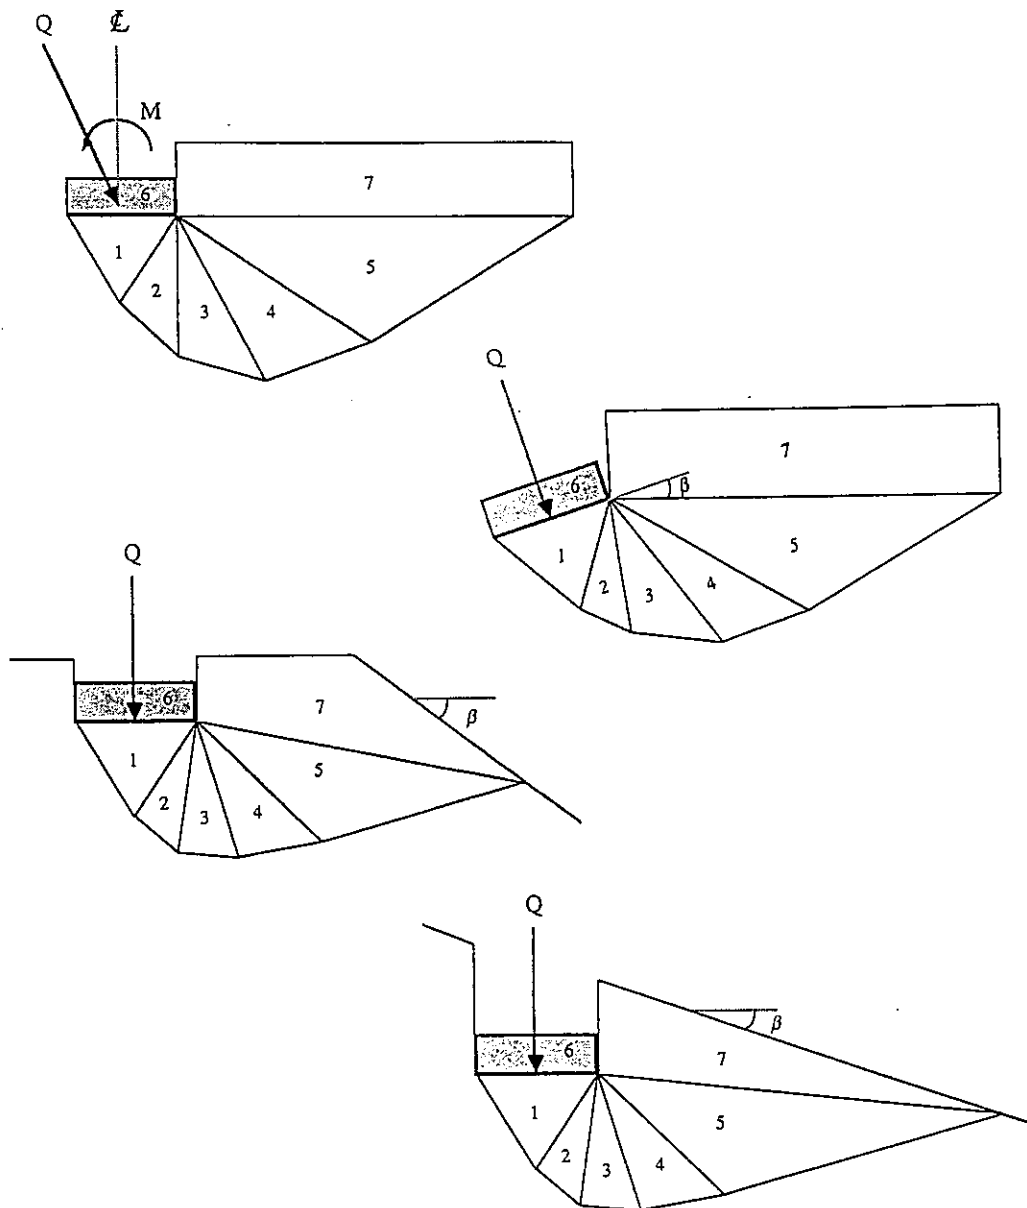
(a) Eccentric and inclined loads; (b) Tilt footing base; (c) Footing adjacent to a slope; (d) Footing on a slope.
